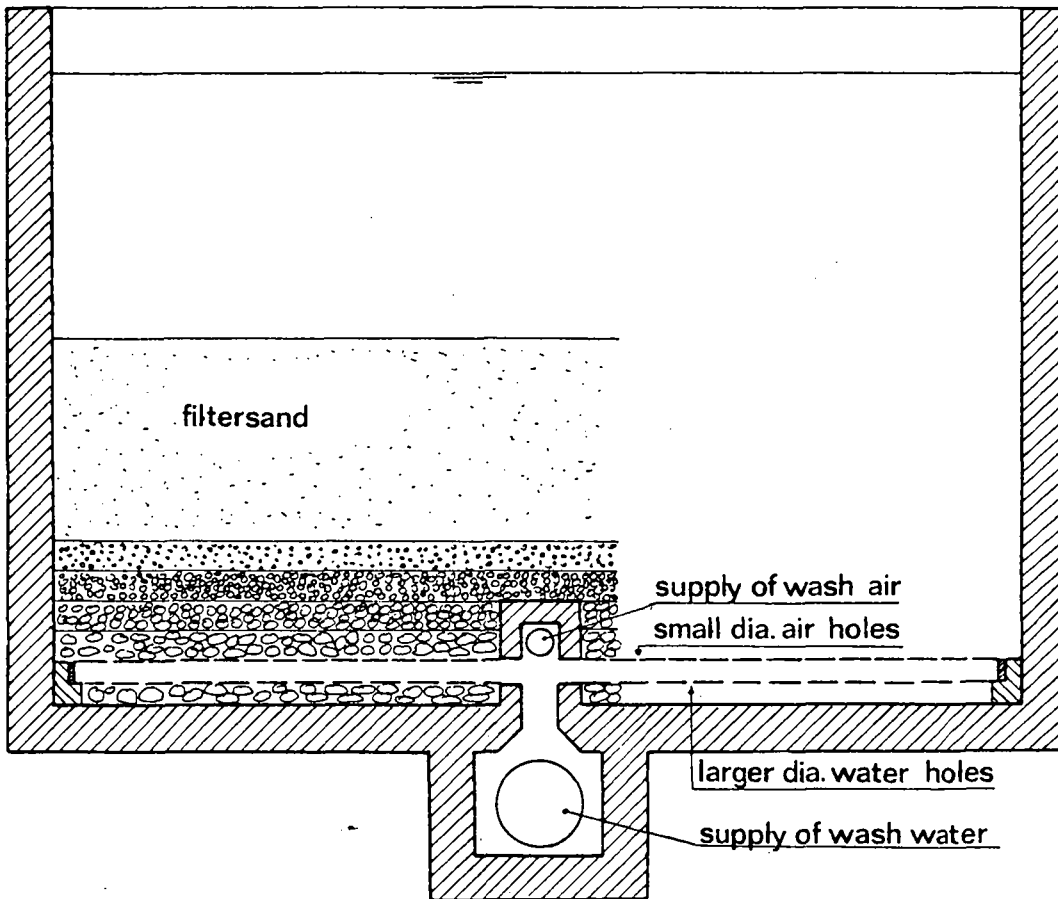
Perforated lateral underdrains for backwashing with water and air.
